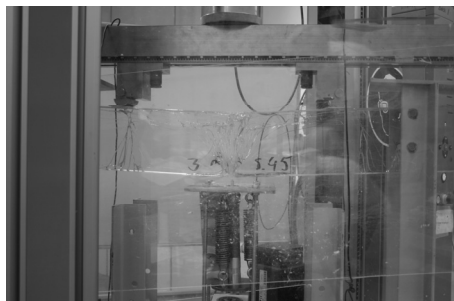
Typical final failure in 3.PVB.S specimen (after resistance test on specimen with model level III damage).
